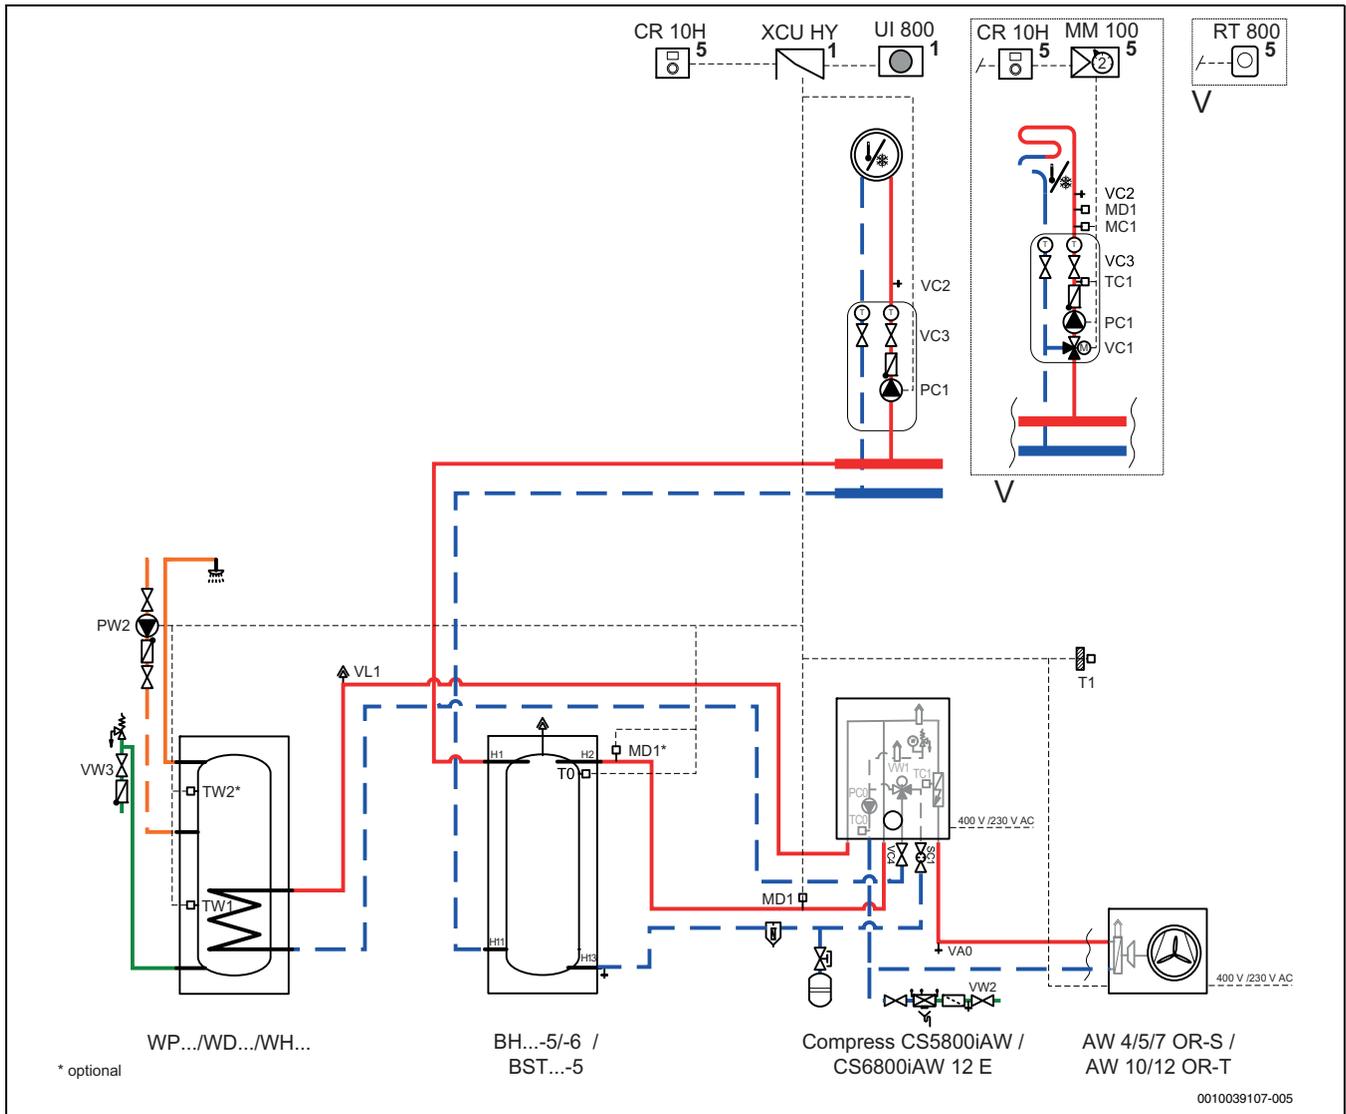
Heat pump, indoor unit, buffer cylinder and water heater
